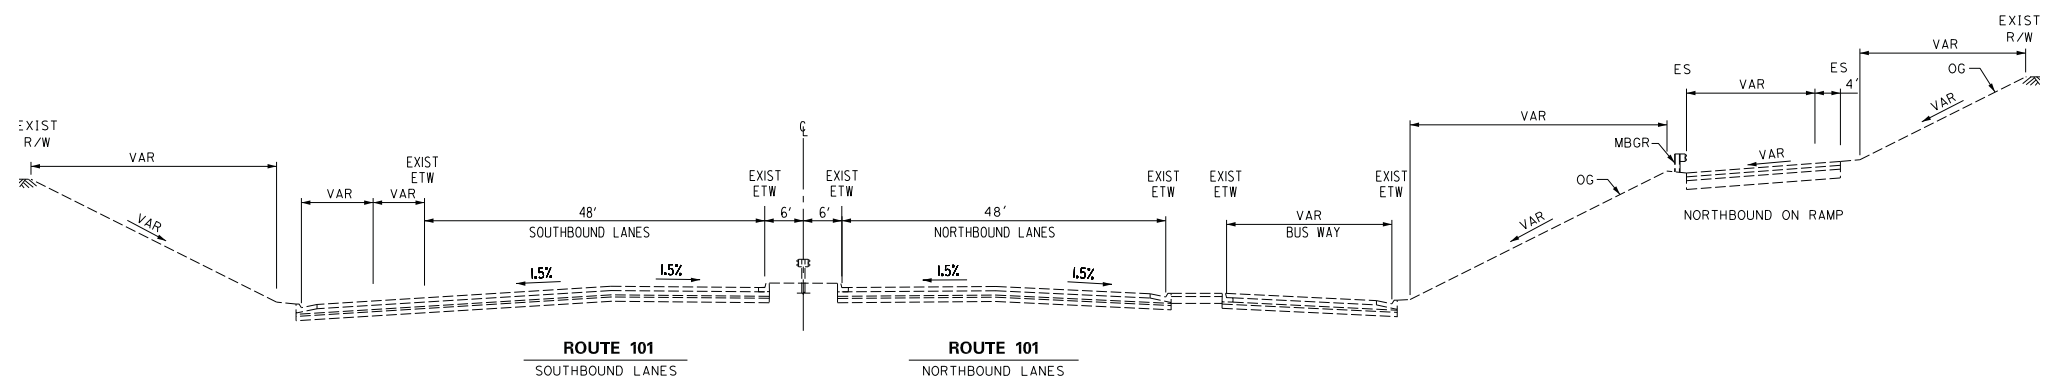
Existing Freeway Typical Section Between Western Avenue and Fountain Avenue
